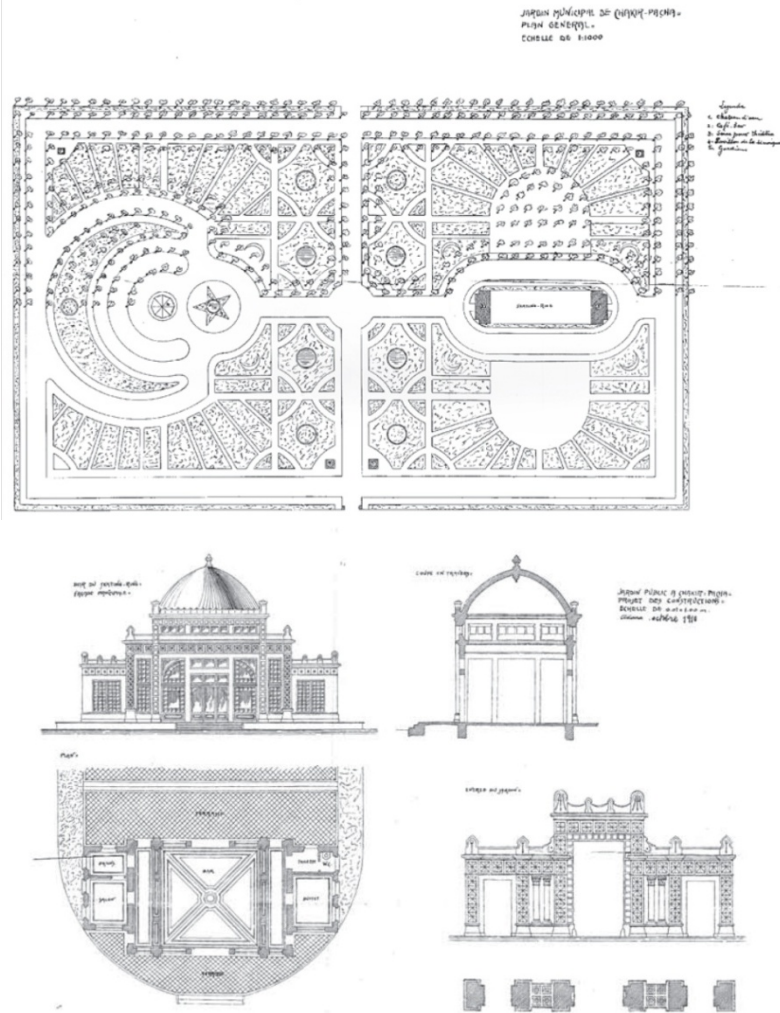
and Figure 5: Şakir Paşa Municipality Park, 1/1000 Plan (top) and Şakir Paşa Municipality Park 1/100 Building Plan and Facades (bottom), (Source: Cengizkan, 2010:41)
